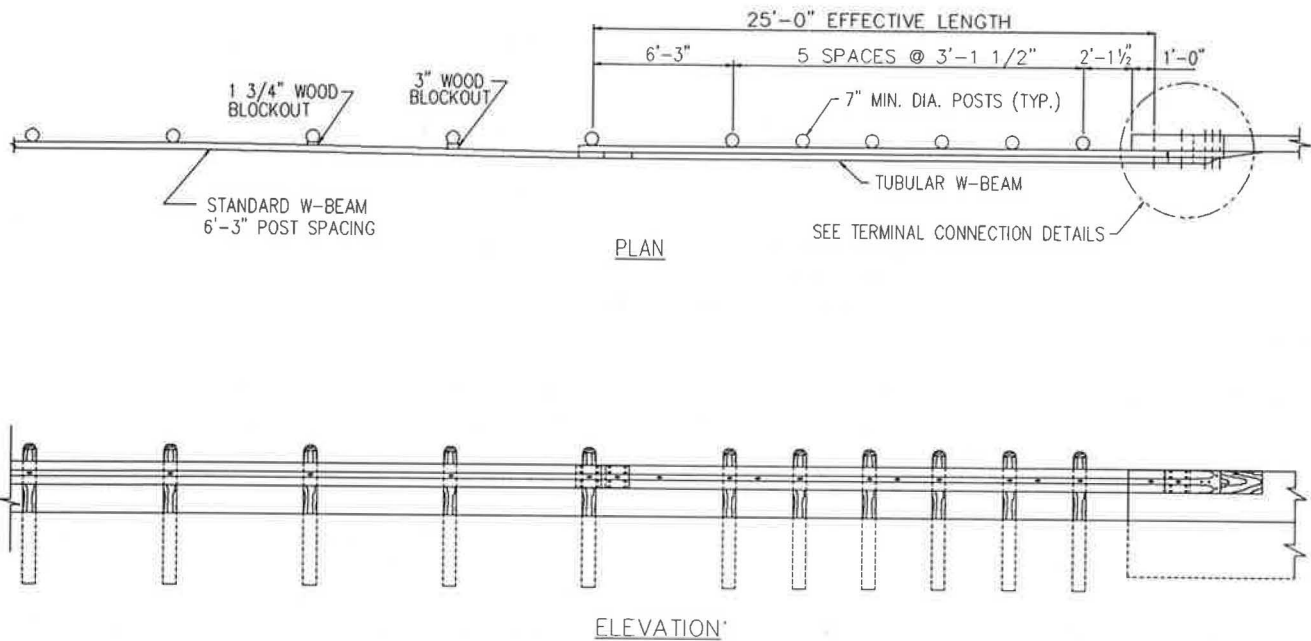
Guardrail-to-bridge-rail transition, retrofit design.
